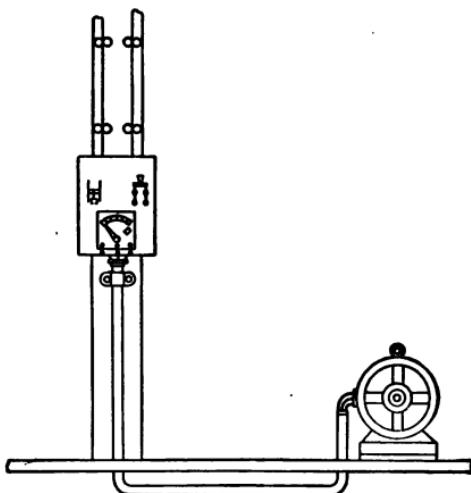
Motor mounted on floor and fed from overhead wiring.
